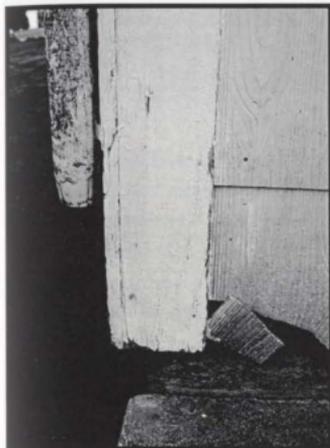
Broken tile, moldy gutter, and mildew growth on corner trim, western elevation.
